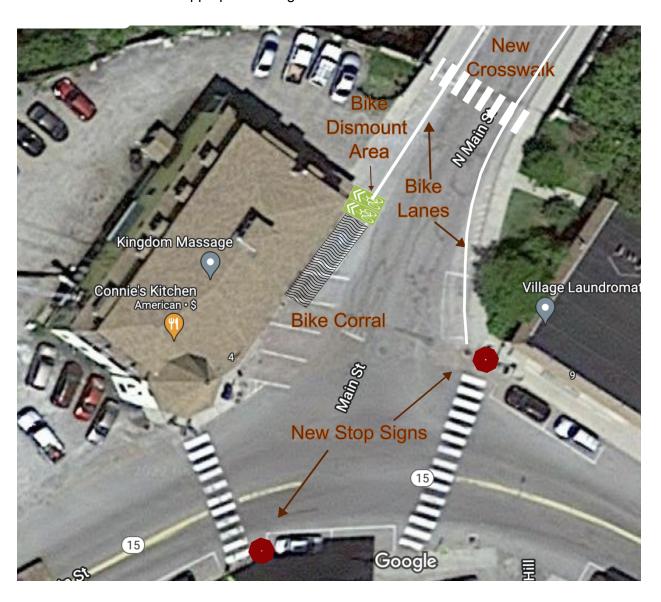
Segment 4 Main St. (Car Bridge to Rt 15)
